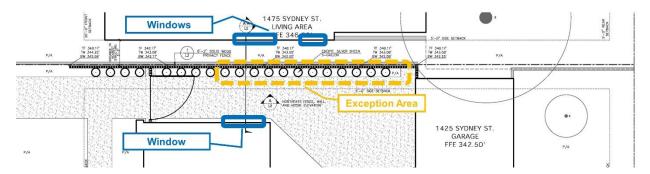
Site Plan showing limited exception area (orange) and window orientations (blue)
